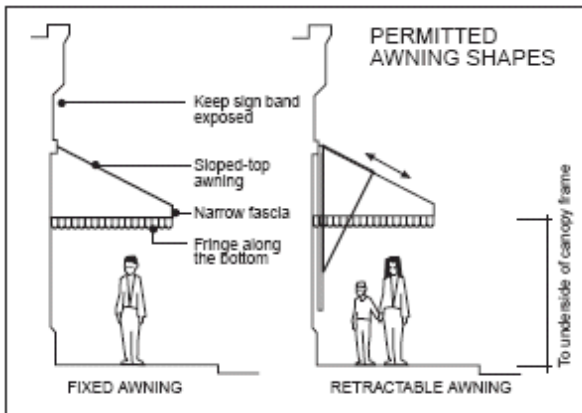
shows the permitted types of awnings and their relation to the building front and sidewalk.
